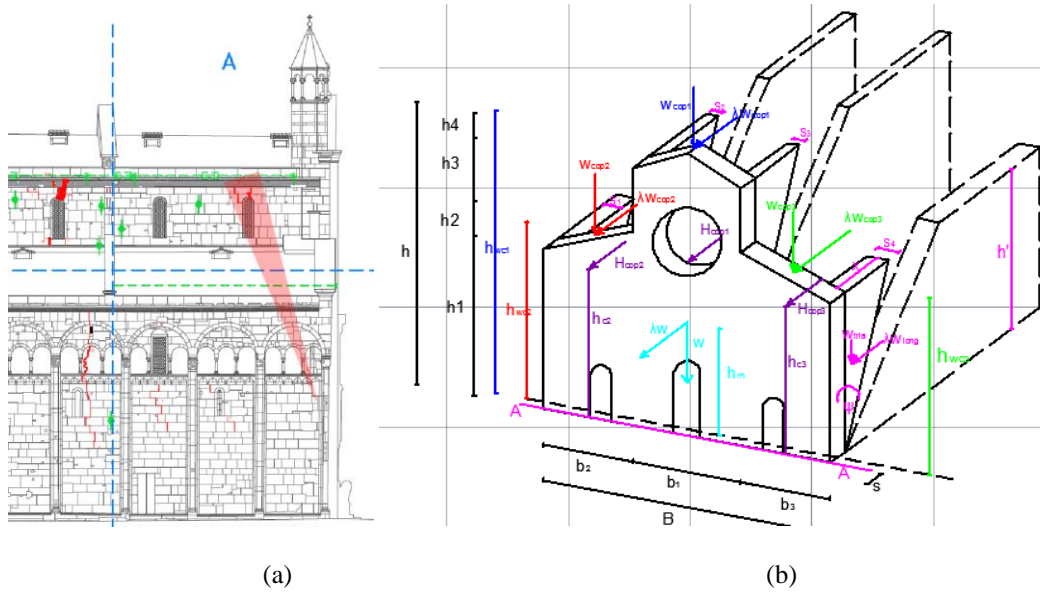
(a) Cracks in longitudinal walls of Cathedral, (b) Overturning of global facade around the base dashed straight line.
